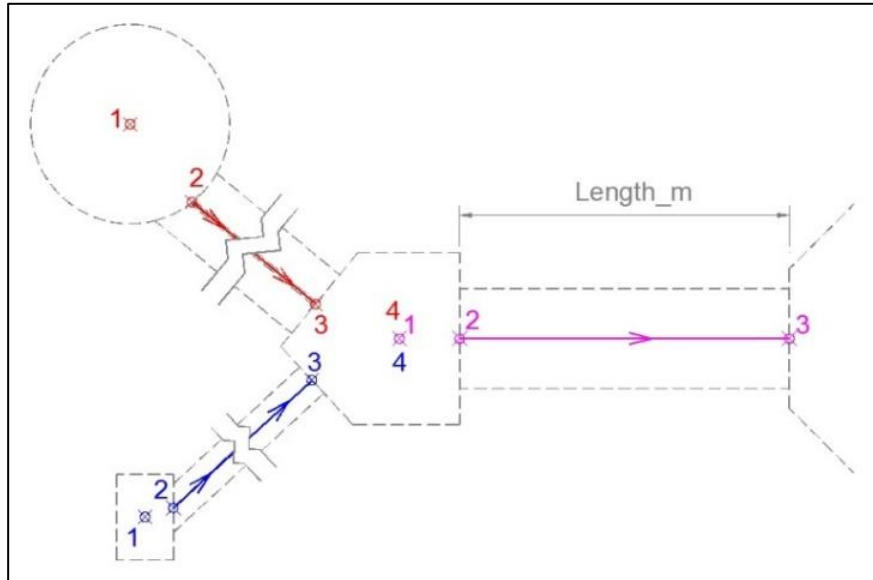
Stormwater Pipe - Irregular shaped pit with multi-celled pipes
